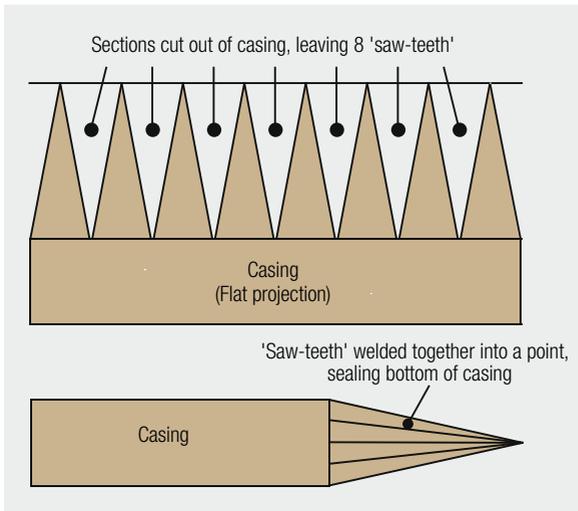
Sealing the bottom end of mild steel casing by the welded 'saw-teeth' method. Typical length of teeth 0.5 to 1m.
